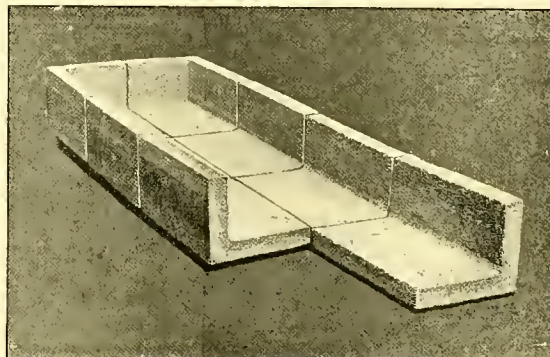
THE PRIAULX TROUGH PLACED ON THE GROUND.
